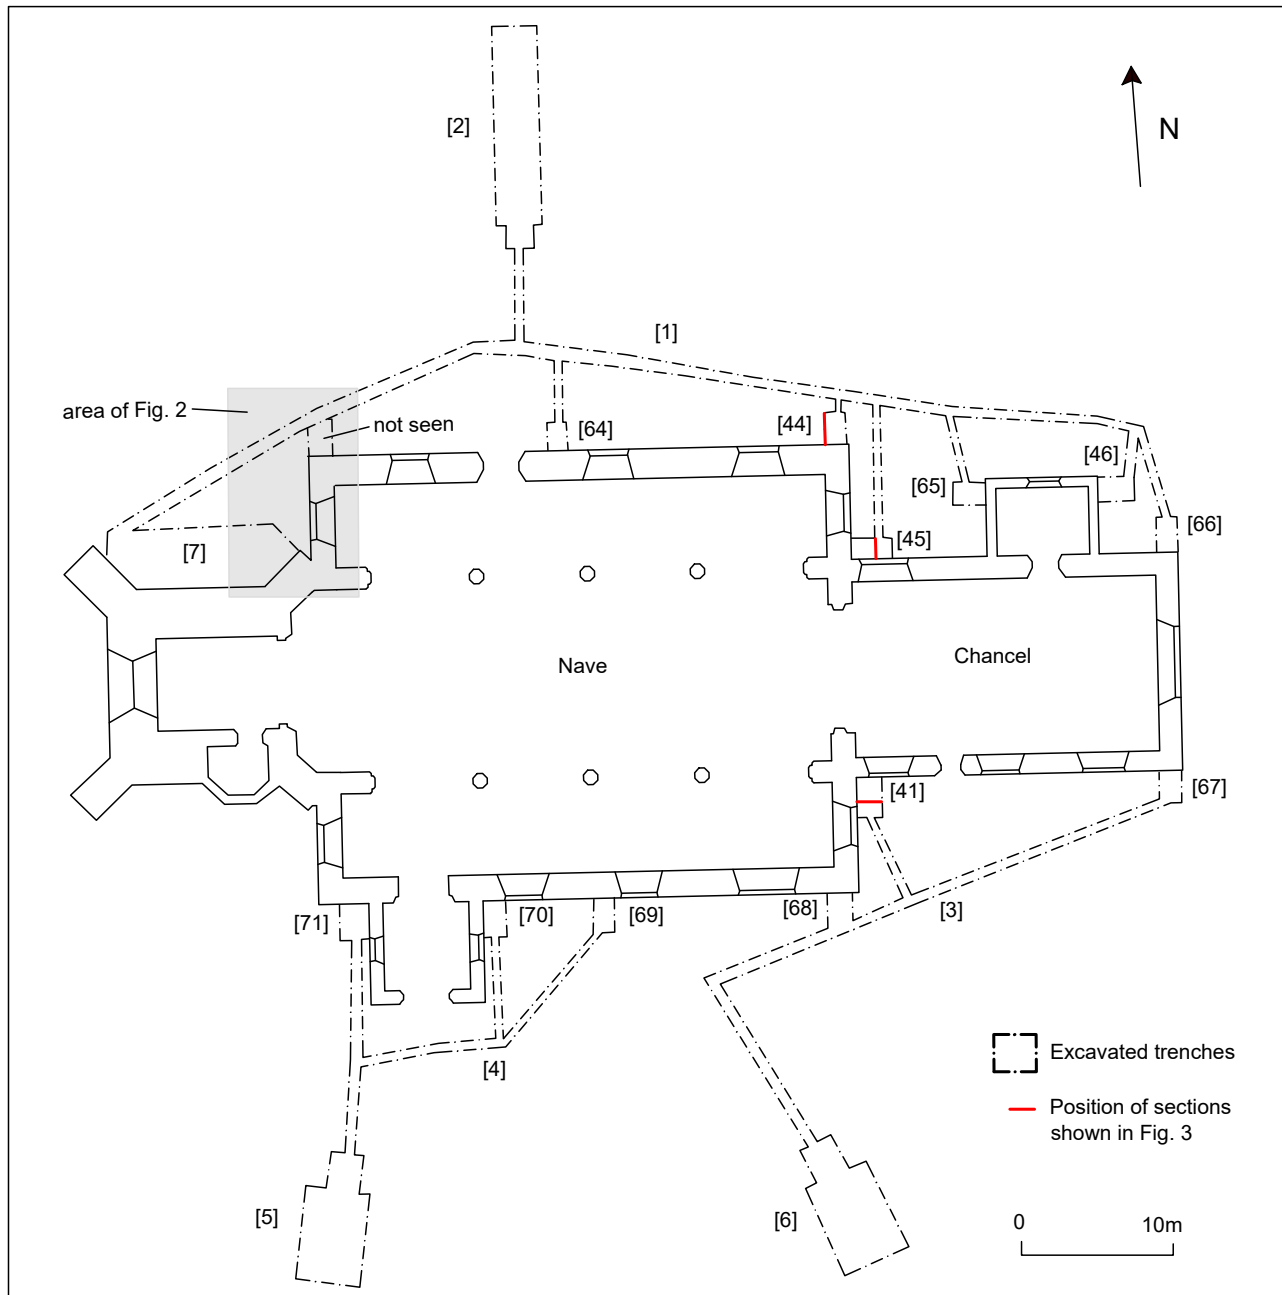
Plan of St John the Baptist Church showing excavated areas, scale 1:250
